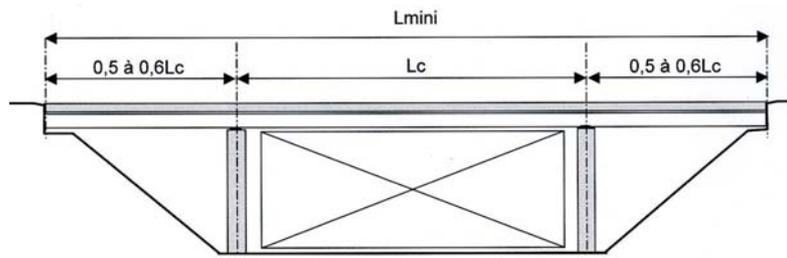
Bridge with imposed pier positions and “short” end spans
